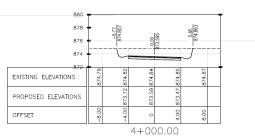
Langa Dam – Cross sections of access road to tunnel outlet portal and Langa Dam Option 1
